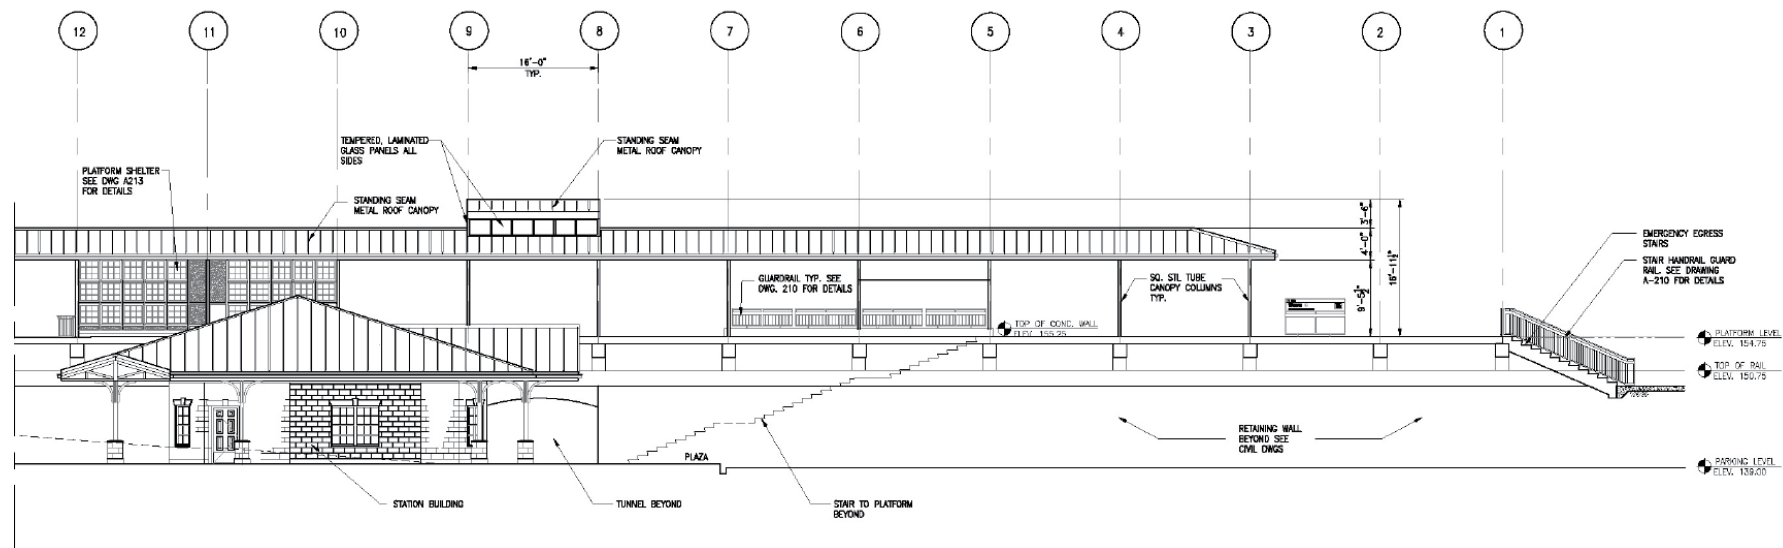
| Proposed cross-section looking west from first crossing of Chester Creek
